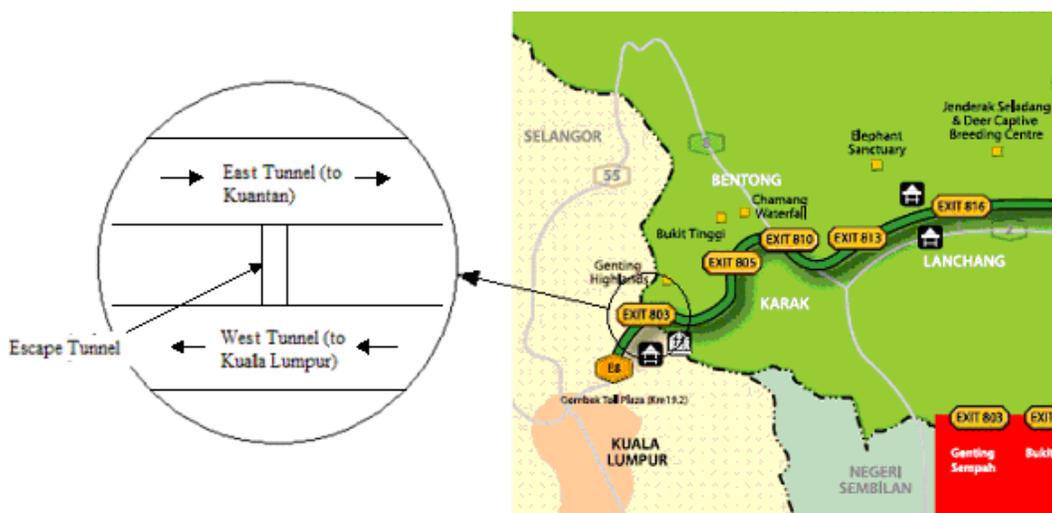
Layout diagram and location of Genting Sempah Tunnel
